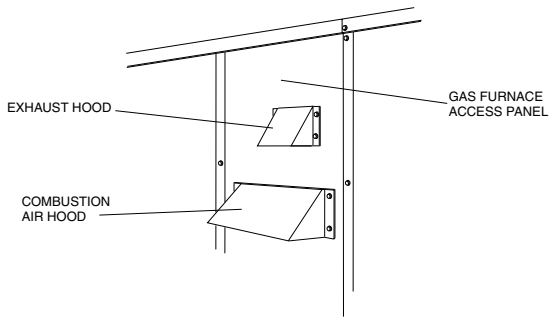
EXISTING GAS FURNACE ACCESS PANEL
